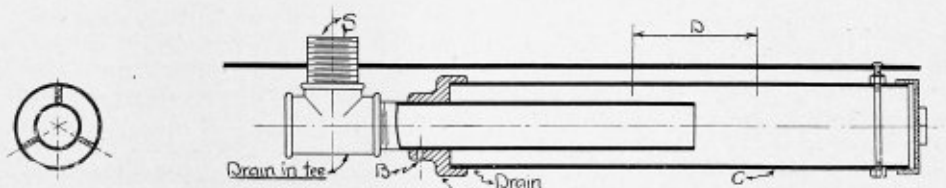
DRY PIPE IN WHICH THE STEAM PIPE IS ENTIRELY SURROUNDED.
